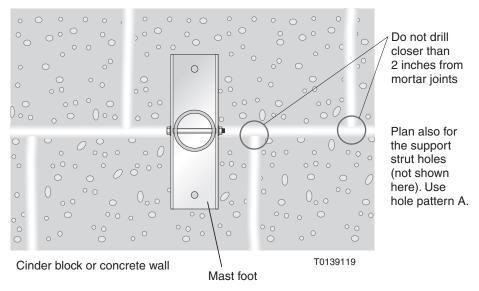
Placing the mast foot on the wall (concrete or block wall)
